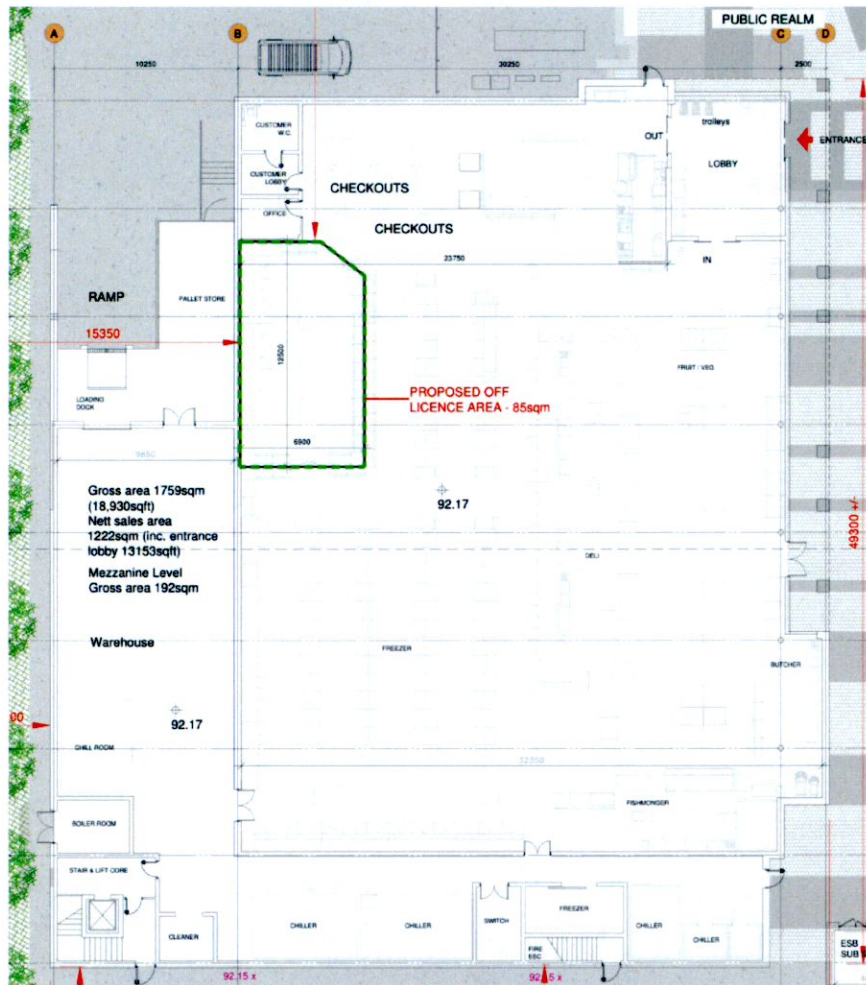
Snip of Site Layout Plan illustrating proposed off licence area
